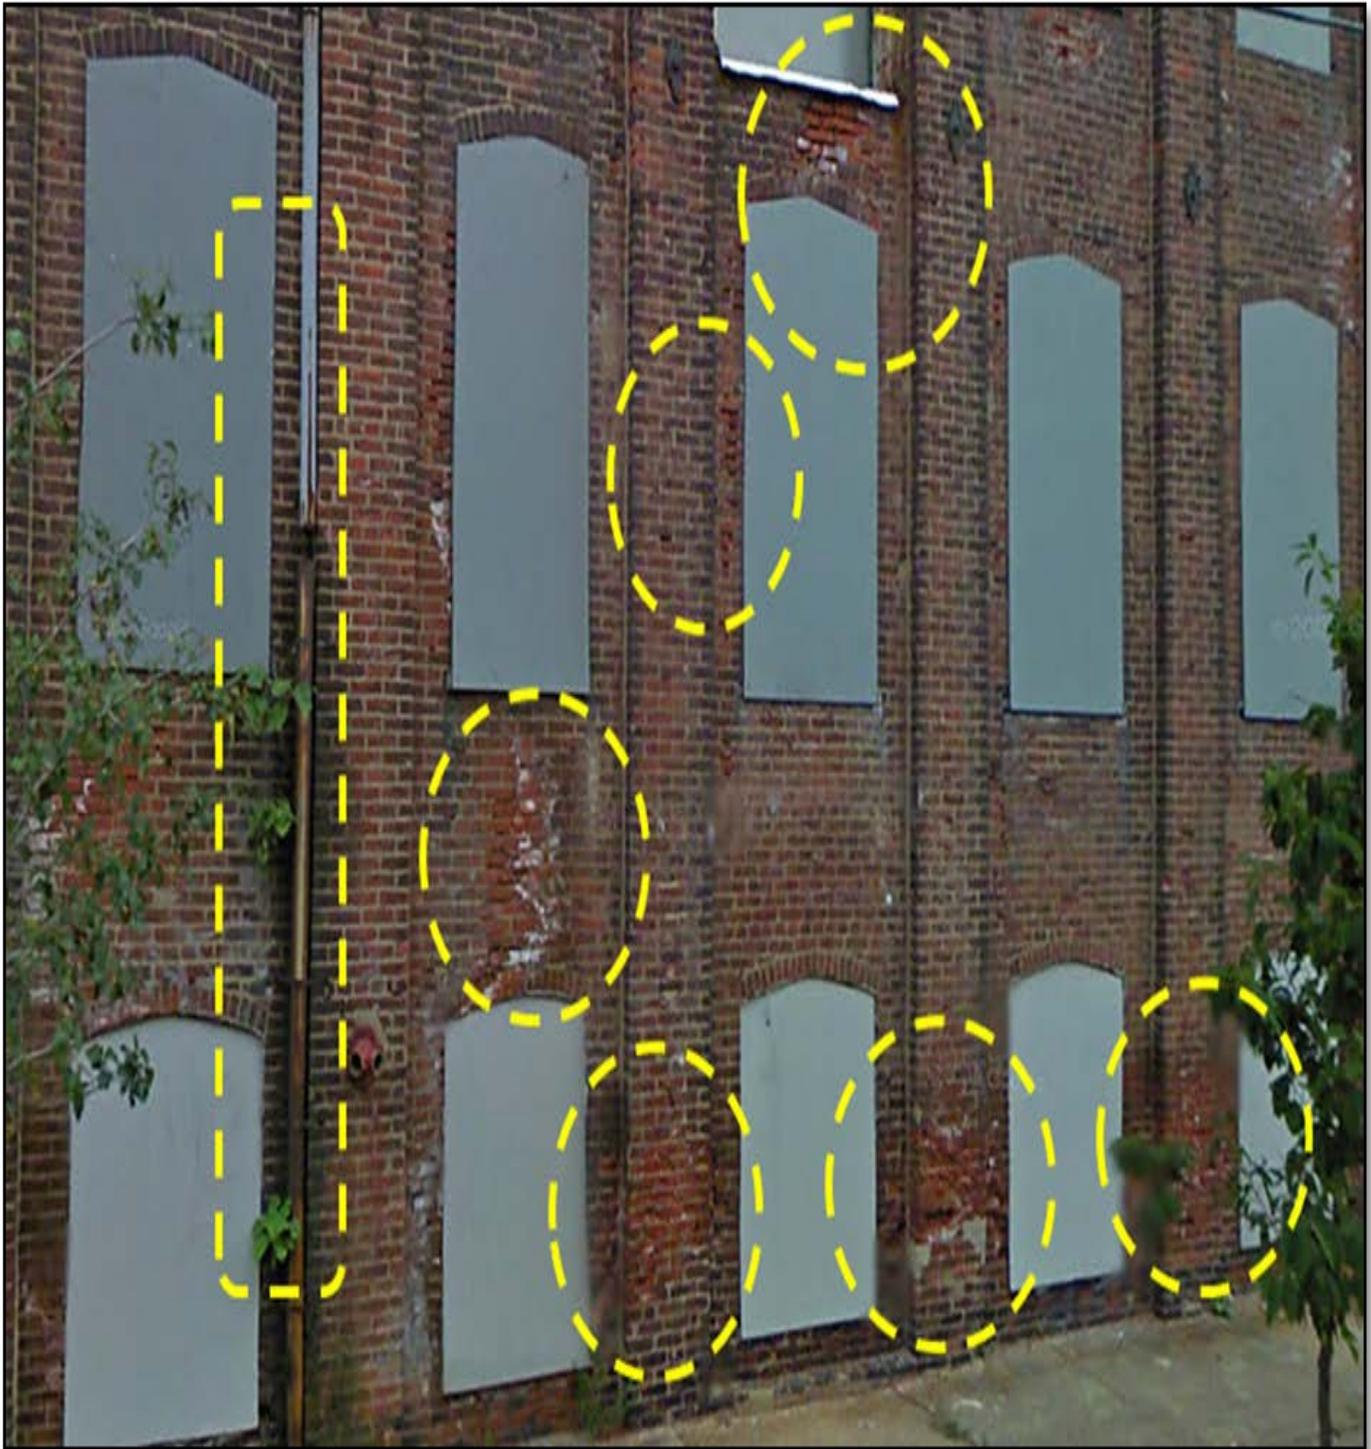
Building 2 Masonry Perimeter Wall Deficiencies – Side “Alpha”.
